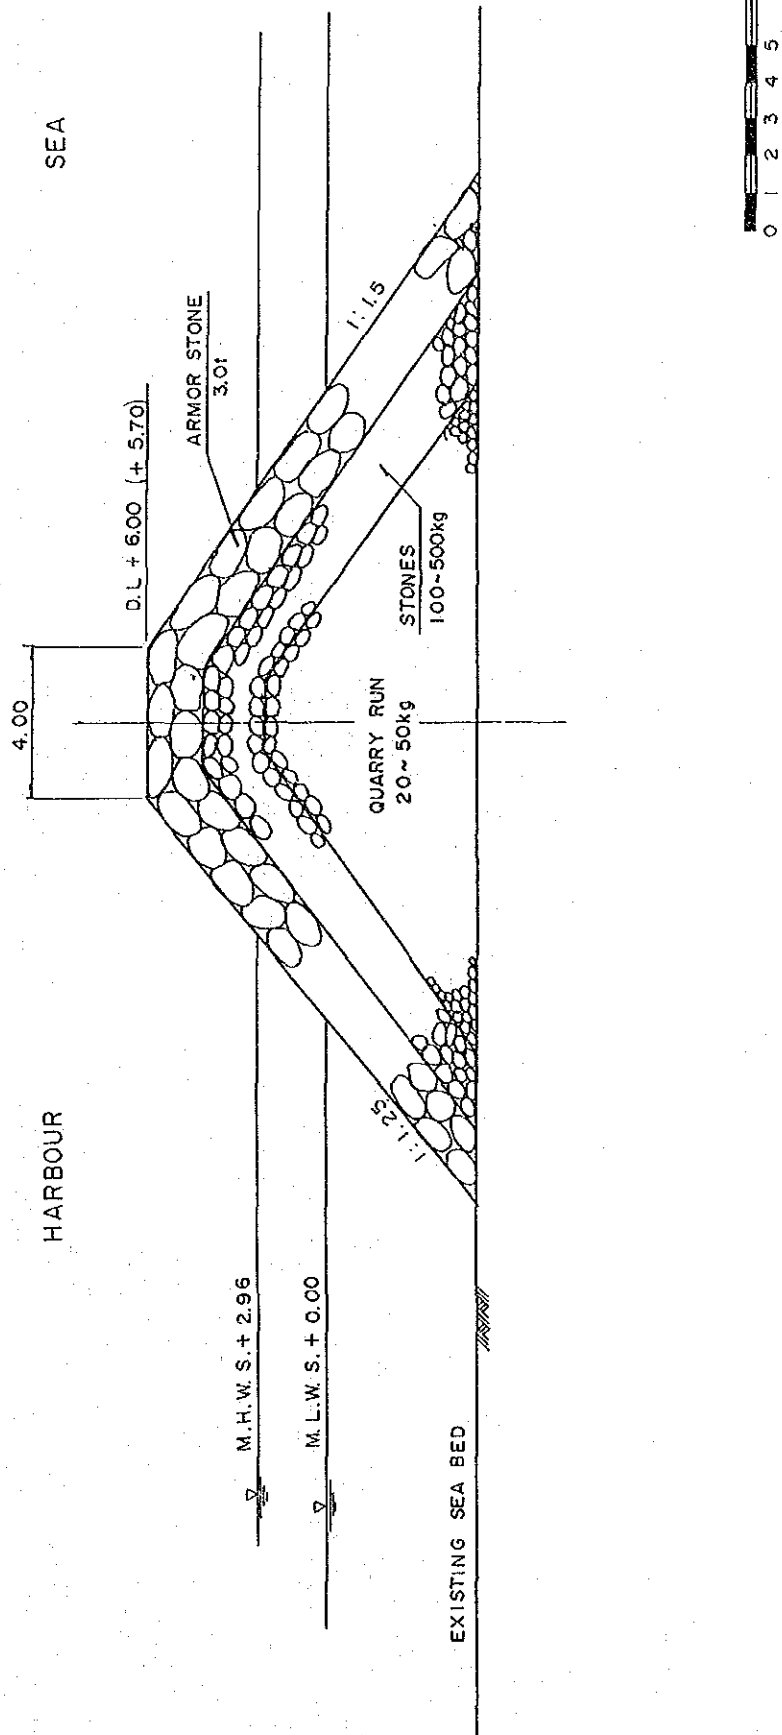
Typical Cross Section of Breakwater(2)
